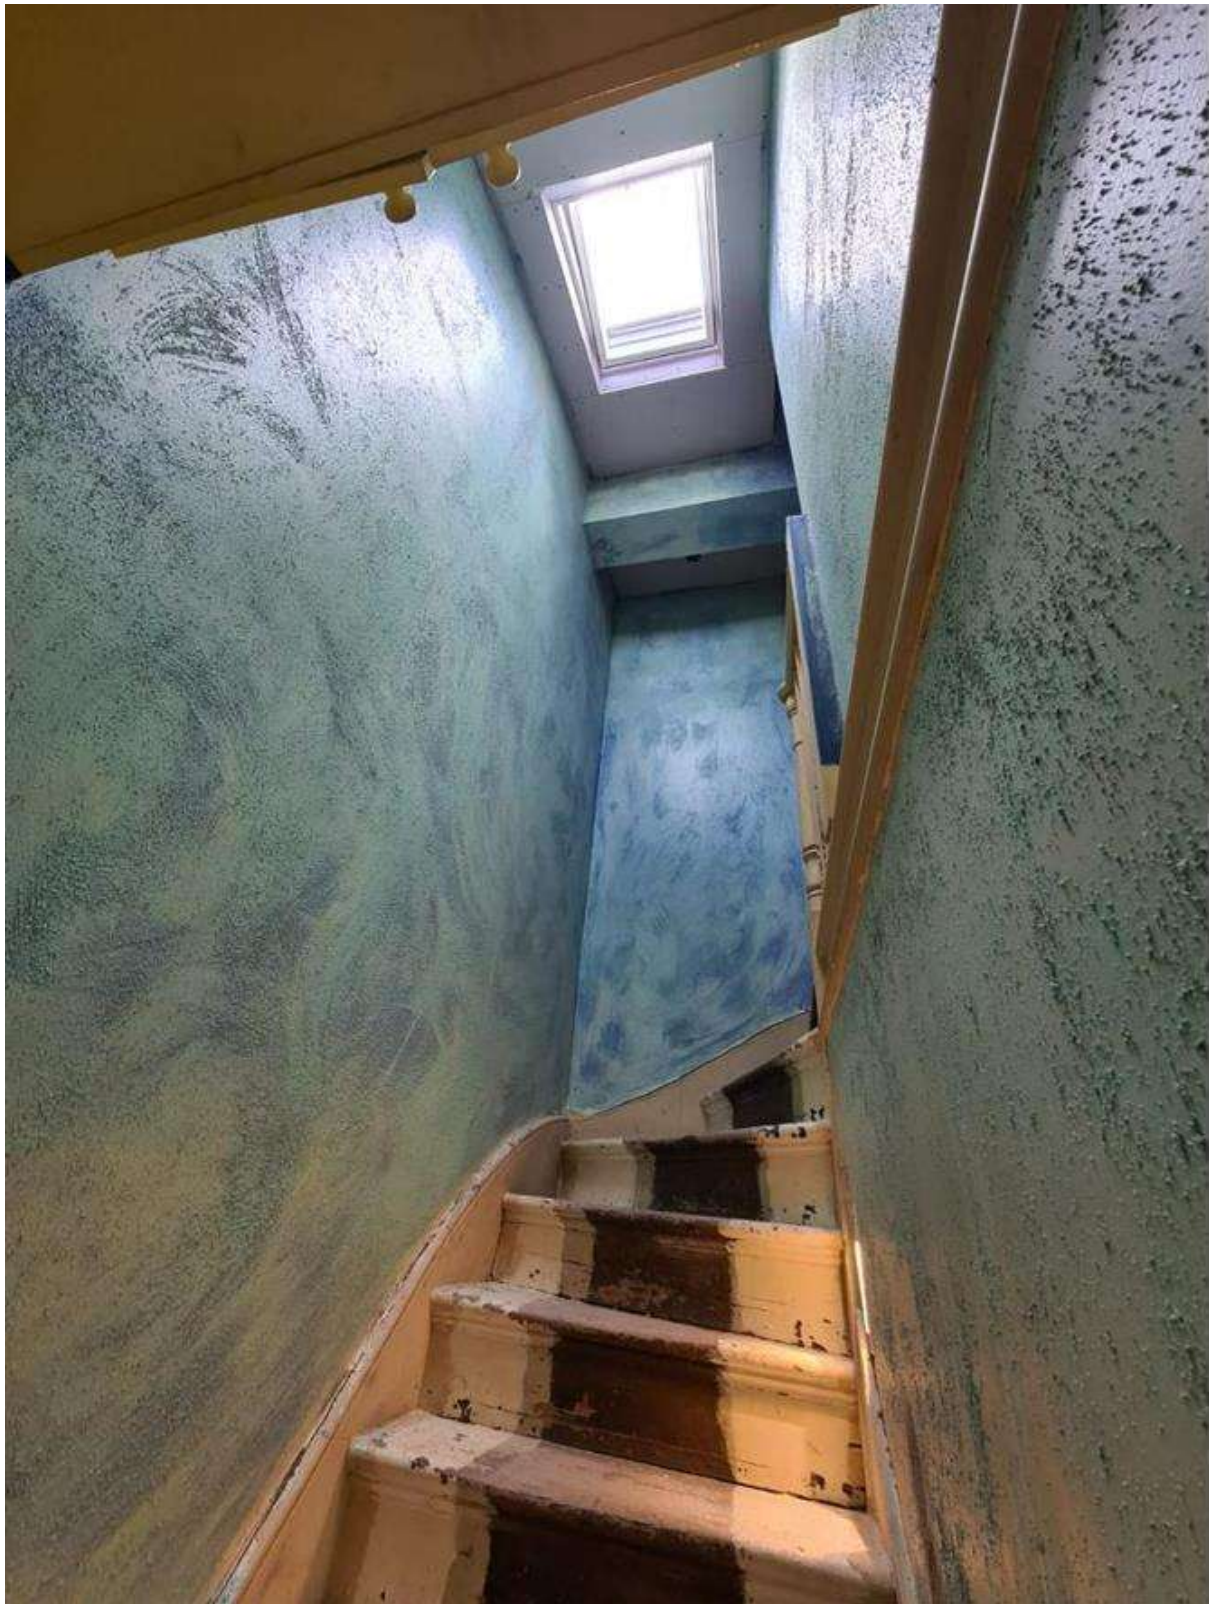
Rooflight (retrospective) from interior, centrally positioned above staircase to provide daylight
